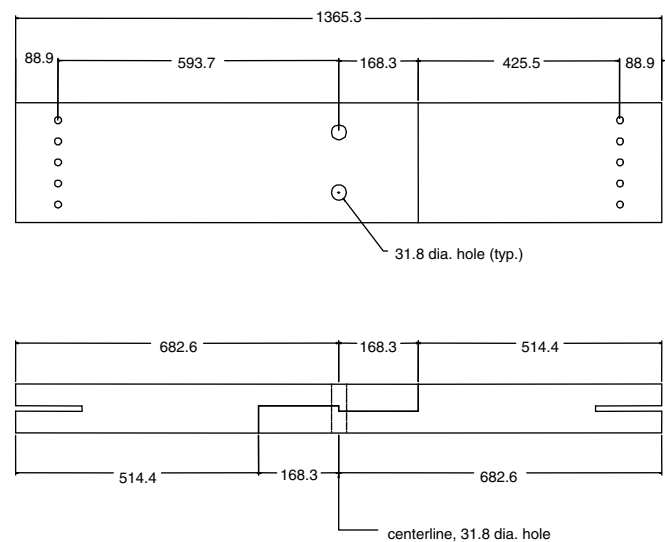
Halved and tabled scarf joint geometry (in millimeters).
